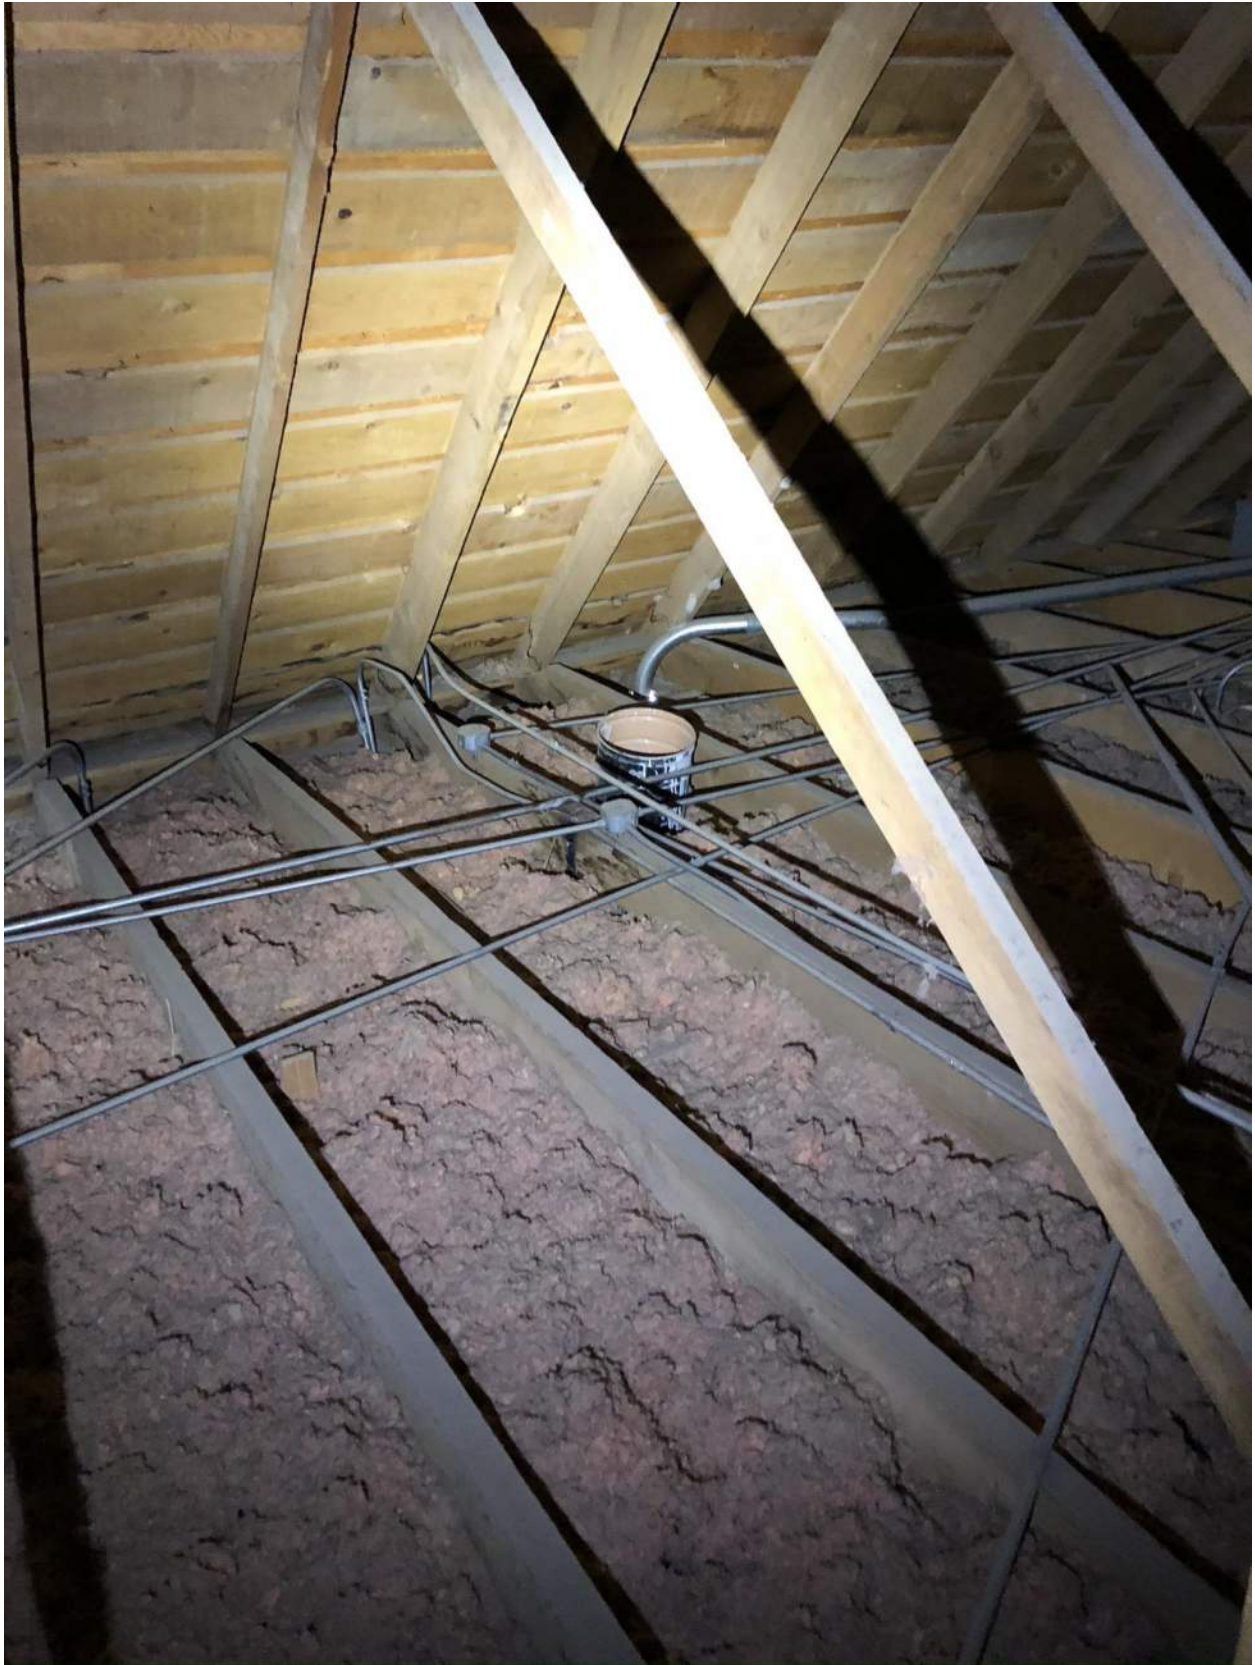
View of roof to wall connection along east and west exterior walls. No in-plane shear connection or out-of-plane anchorage to the stone wall below.
